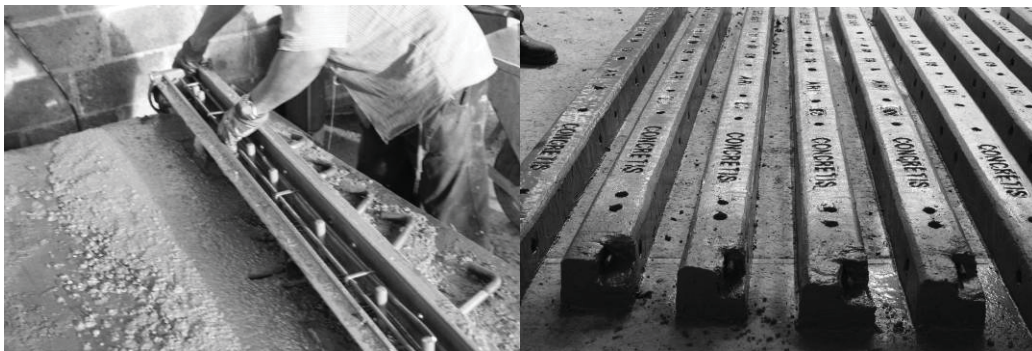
Molding of concrete crossheads for electrical distribution networks
